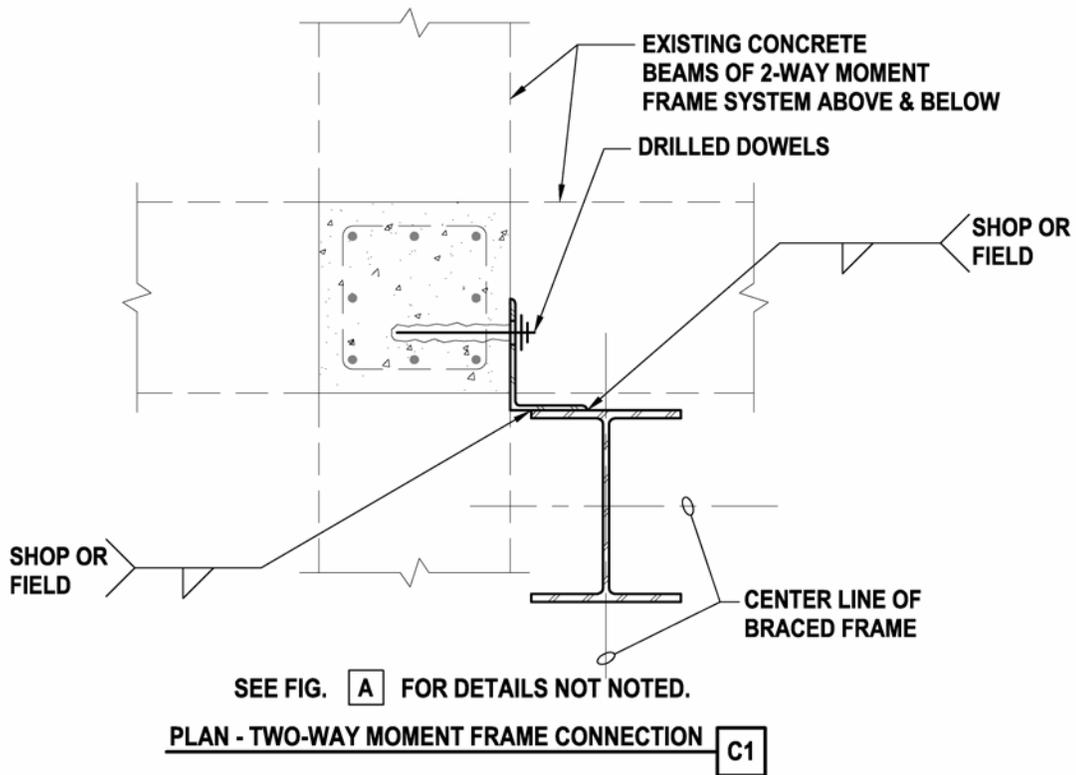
C: Typical Connection to Existing Concrete Column
